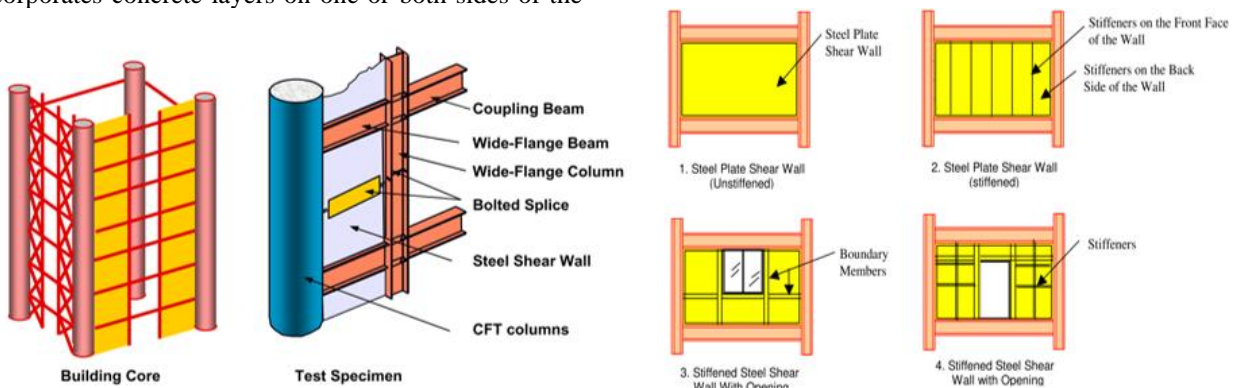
A steel building employs an inventive steel shear wall system^[23, 26].
